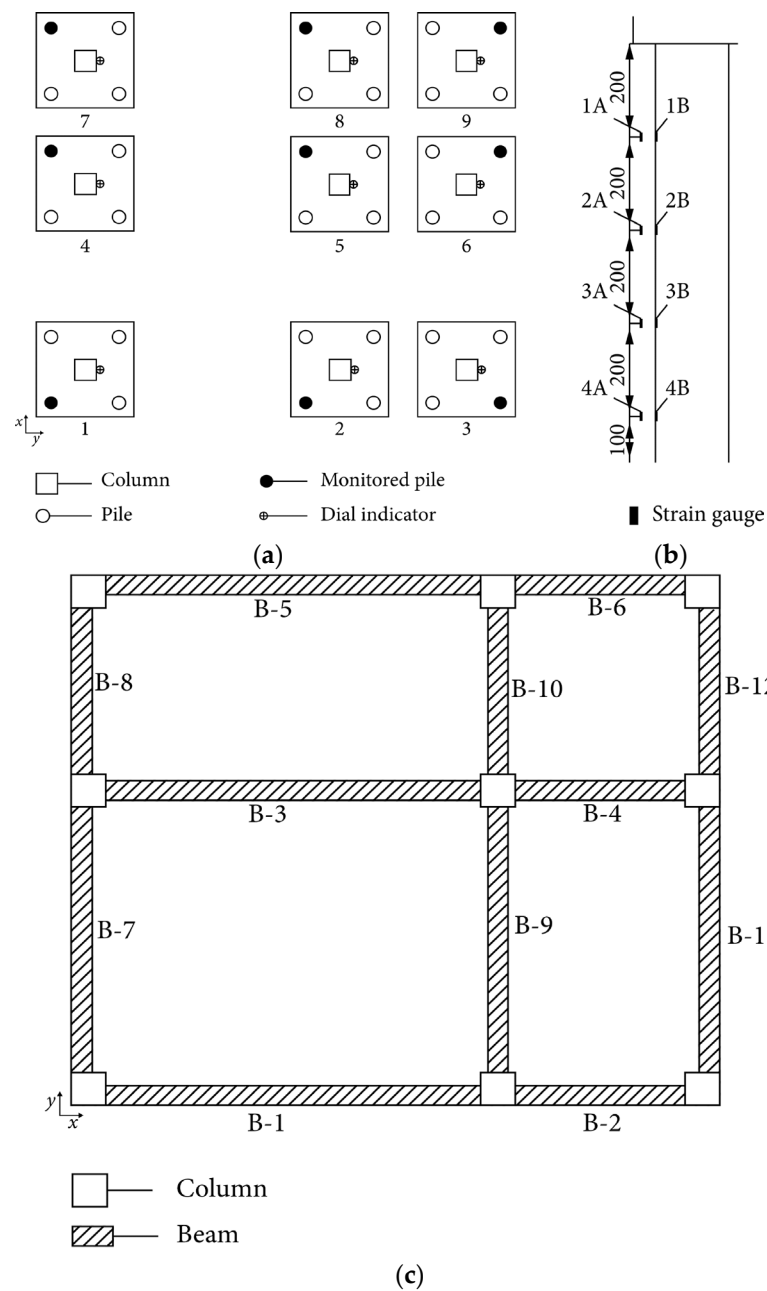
(a) Instrument setup plan; (b) layout of monitoring pile positions; (c) layout of number of crossbeams.
